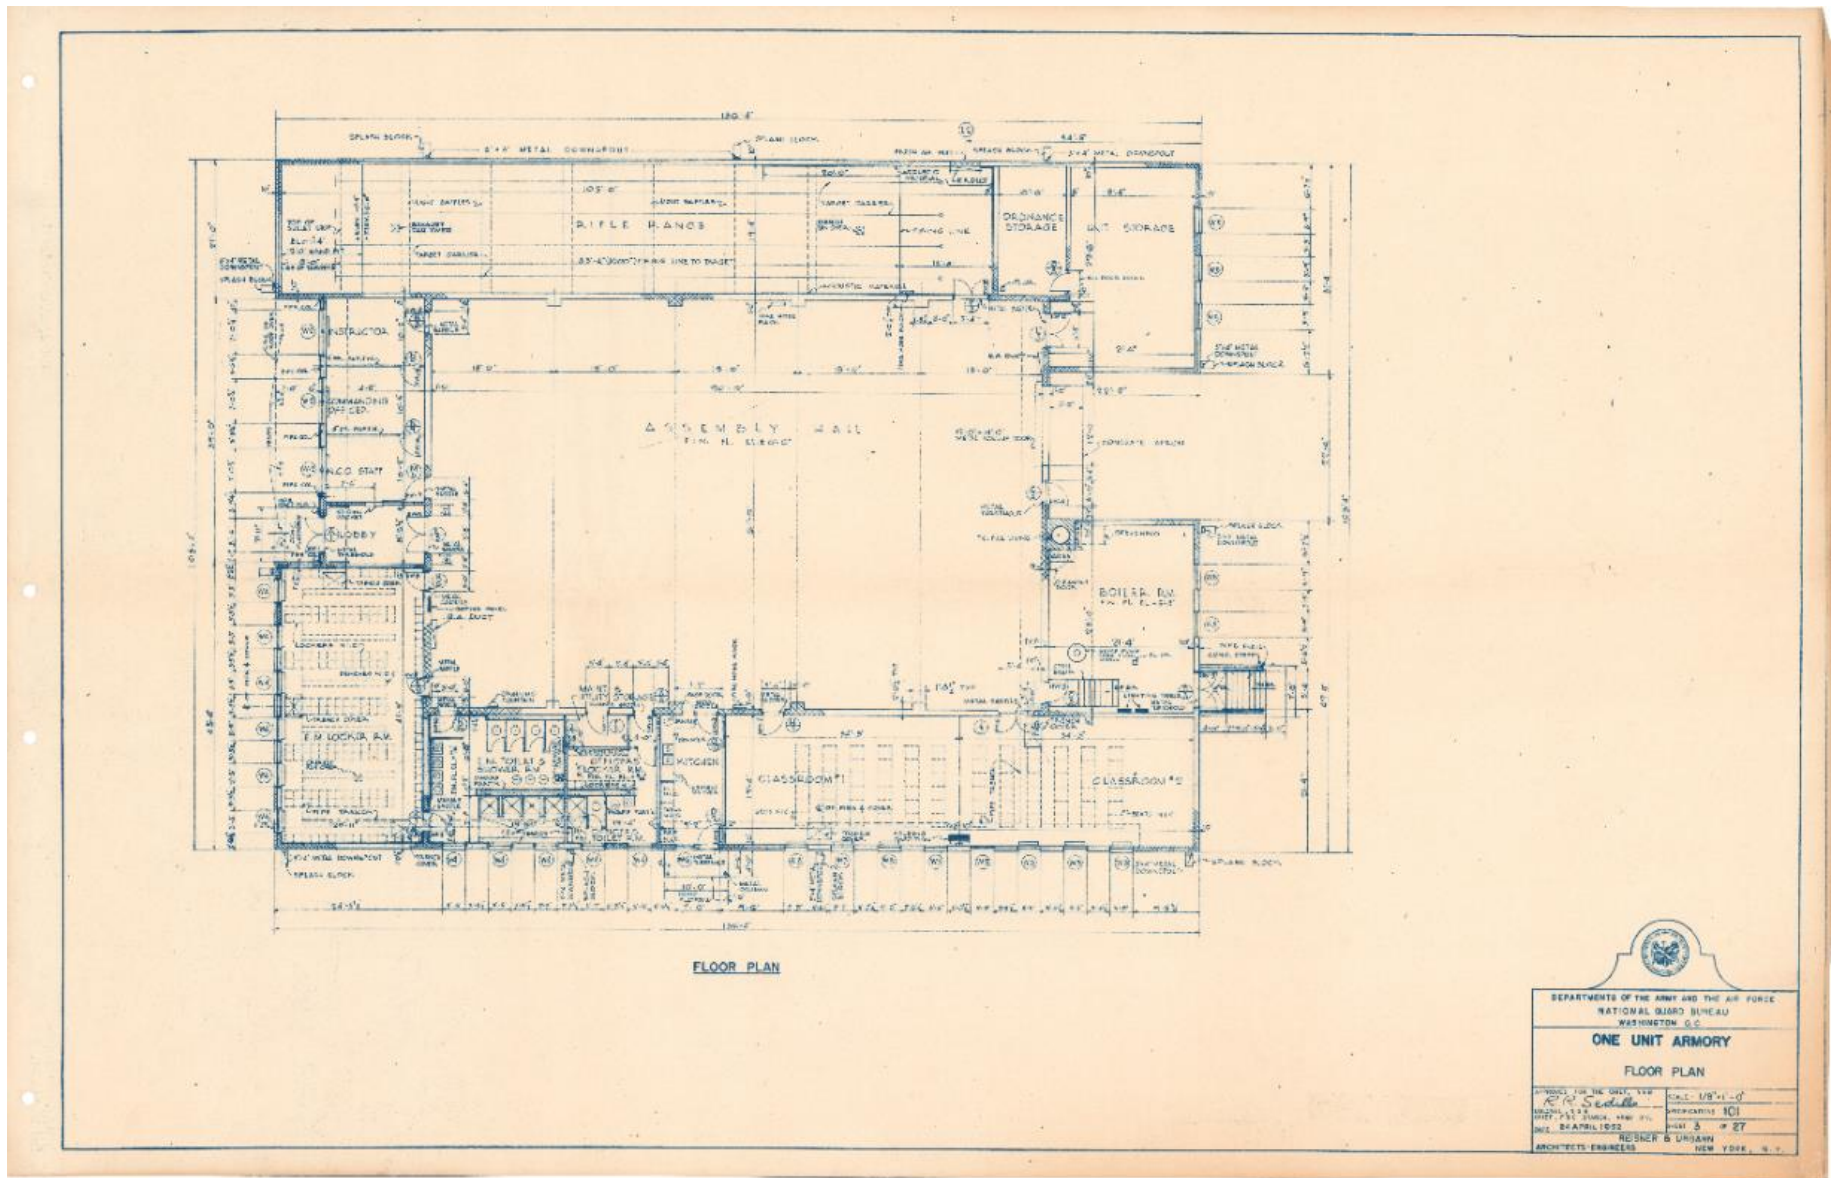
NGB One-unit Armory Floor Plan by Reisner & Urbahn, 1952 (OMD archives).
